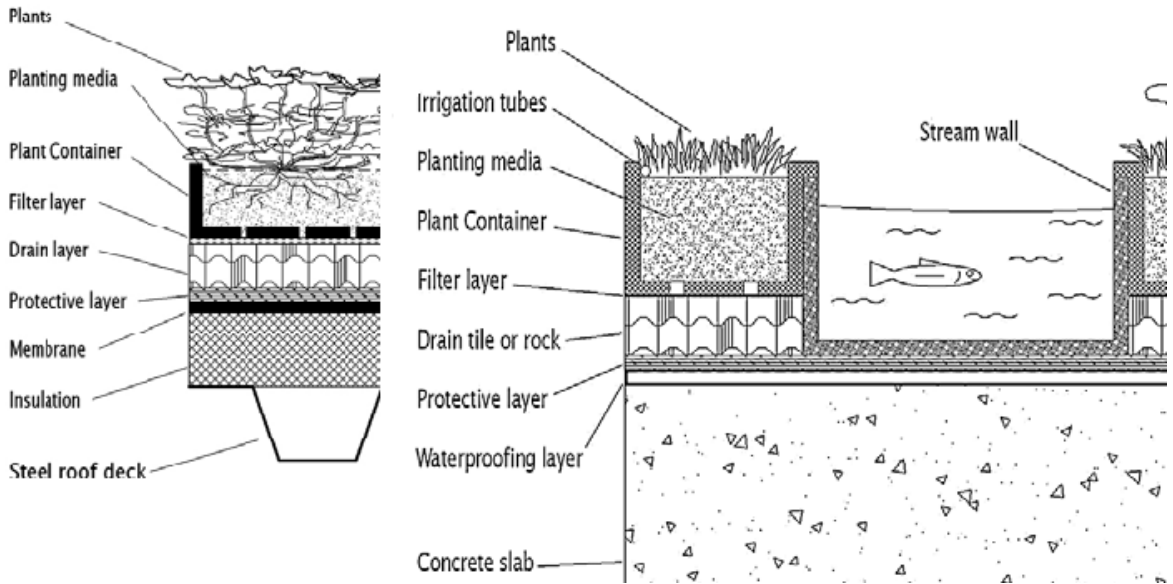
Extensive Green Roof Construction Fig.2 Intensive Green Roof Construction
